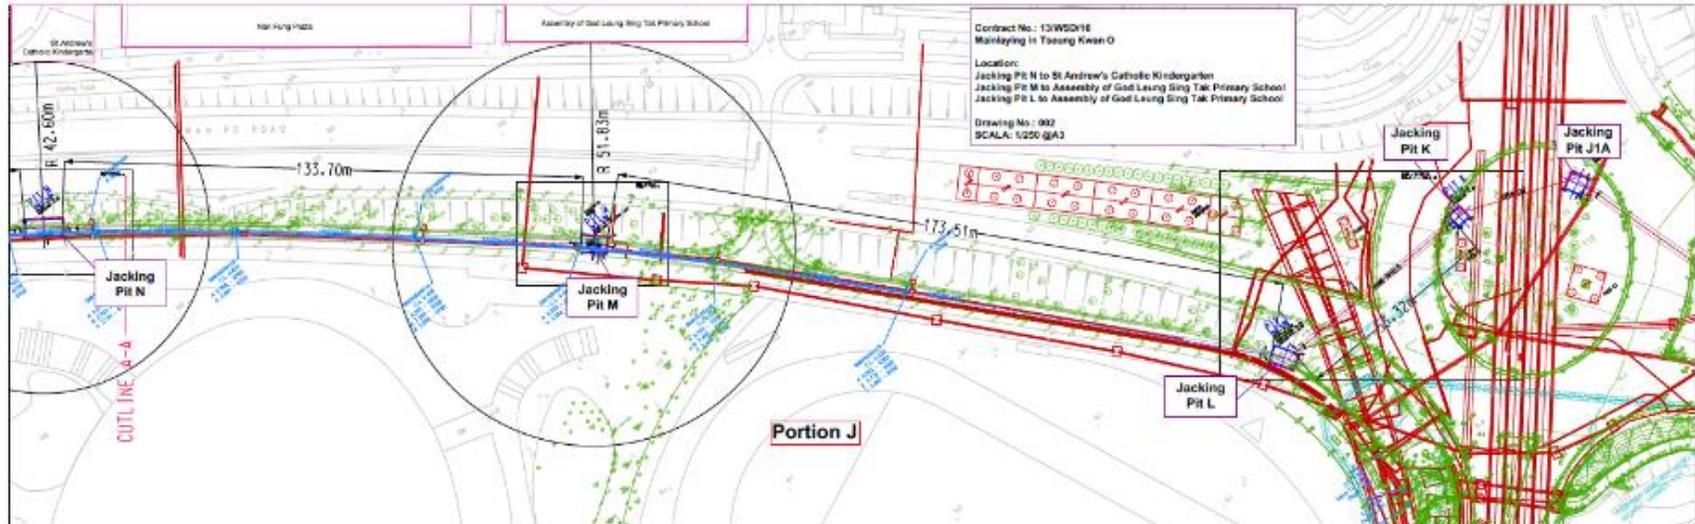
Location Plan for Portion J – Pit L-M-N, K, J1A
